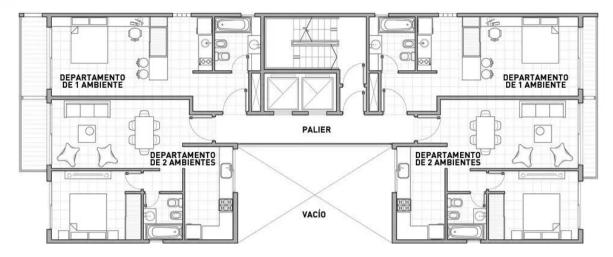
Common building type approximately 25m deep from front to rear façade - note bathroom and kitchen windows in party walls will eventually be covered by neighbouring buildings.
